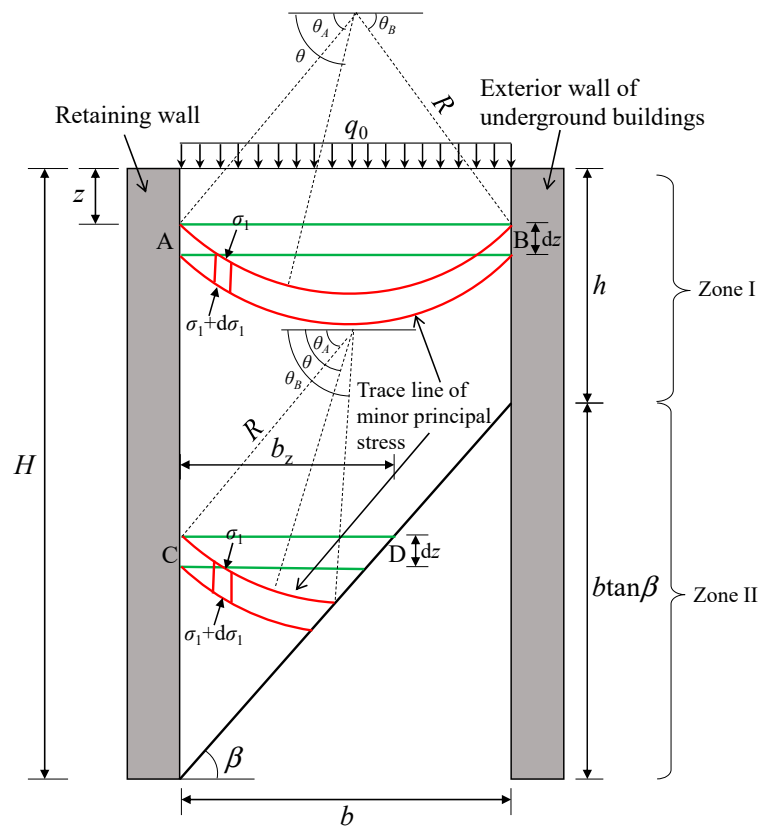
Narrow backfill behind retaining wall and its trajectory of minor principal stress.
